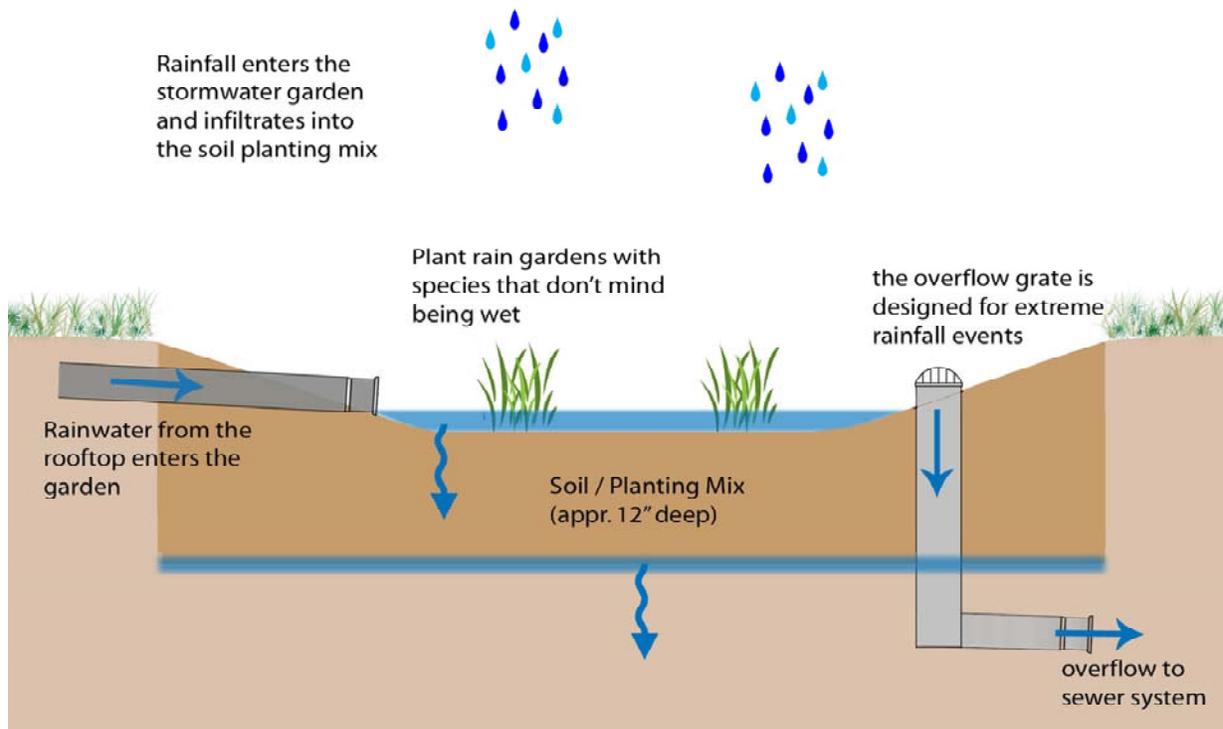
Schematic Detail of Rain Garden/bioinfiltration bed
